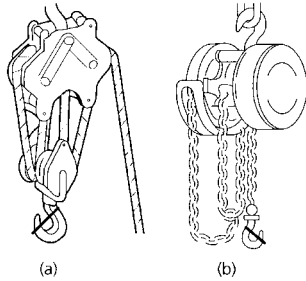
Manual lifting equipment: (a) rope pulley blocks (snatch blocks); (b) chain blocks (geared)
